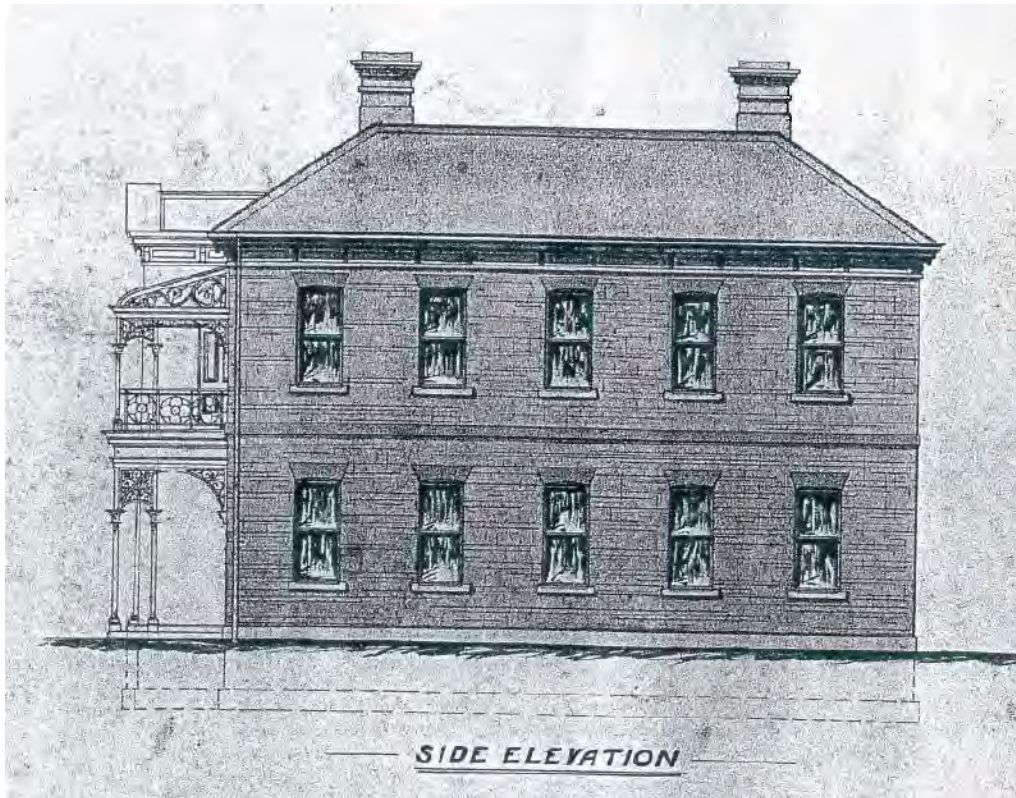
Side elevations of the original 1887 construction. Verandah and balcony on the Wilson Street Side (Source: 1997 CMP)
